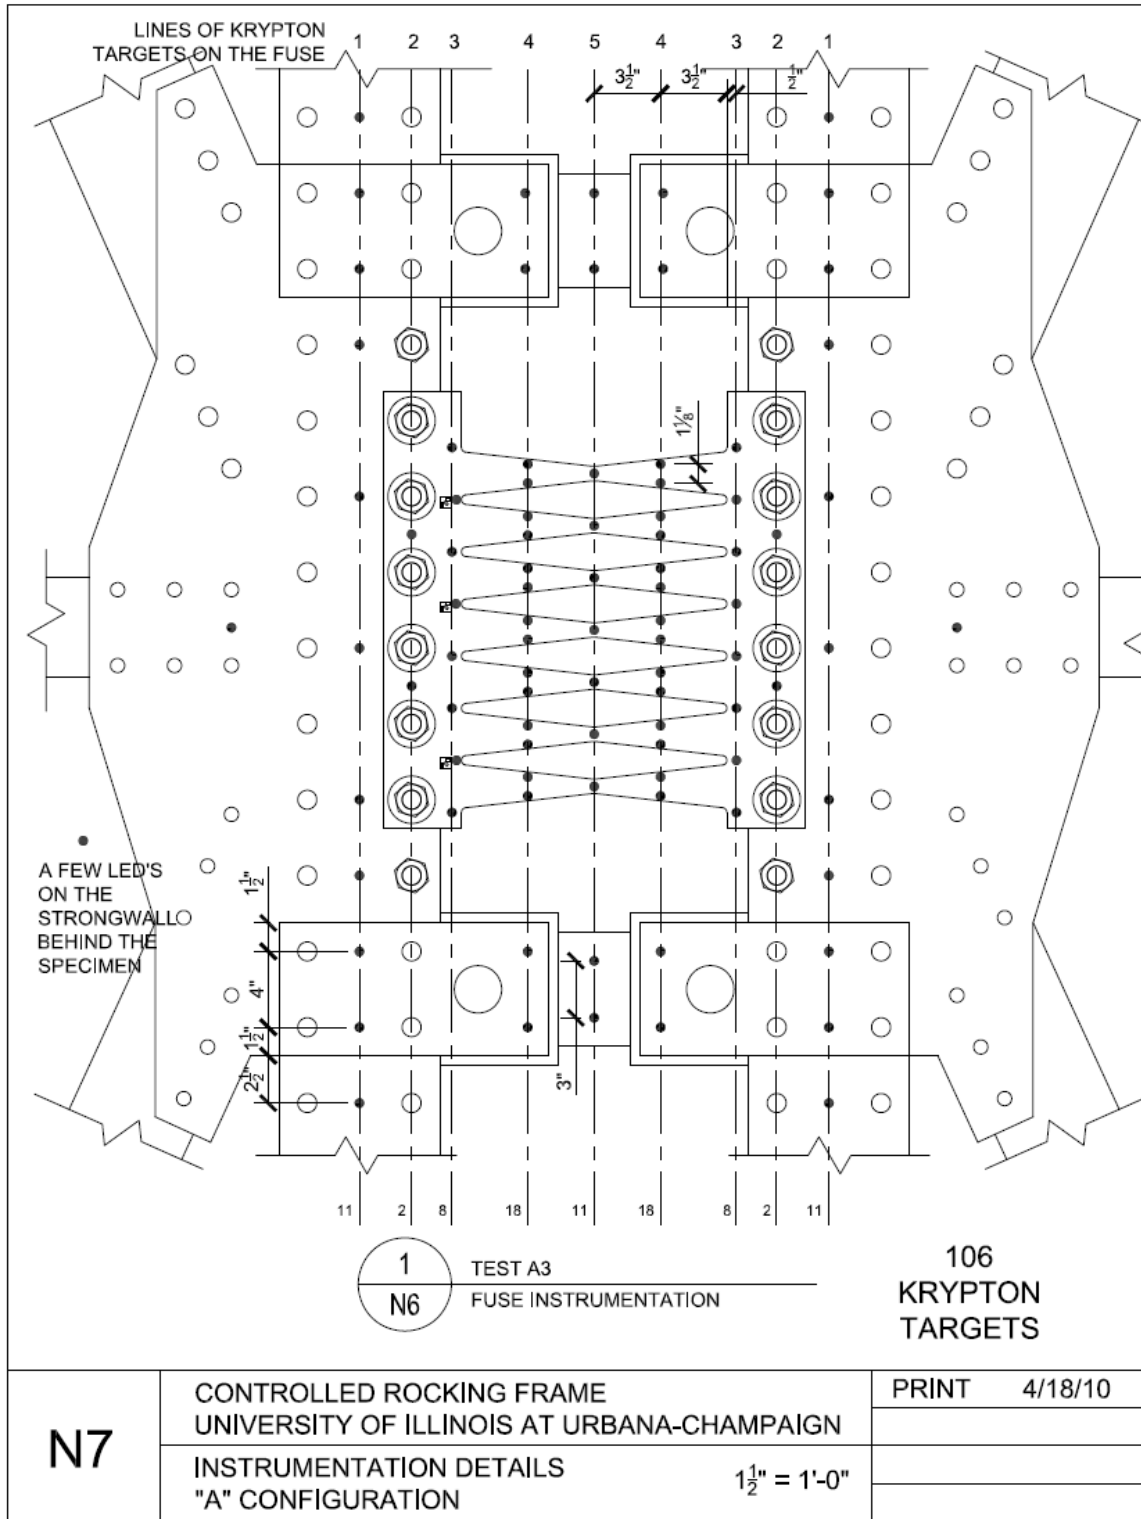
Instrumentation Plan Drawing – Krypton LED’s for Specimen A3
